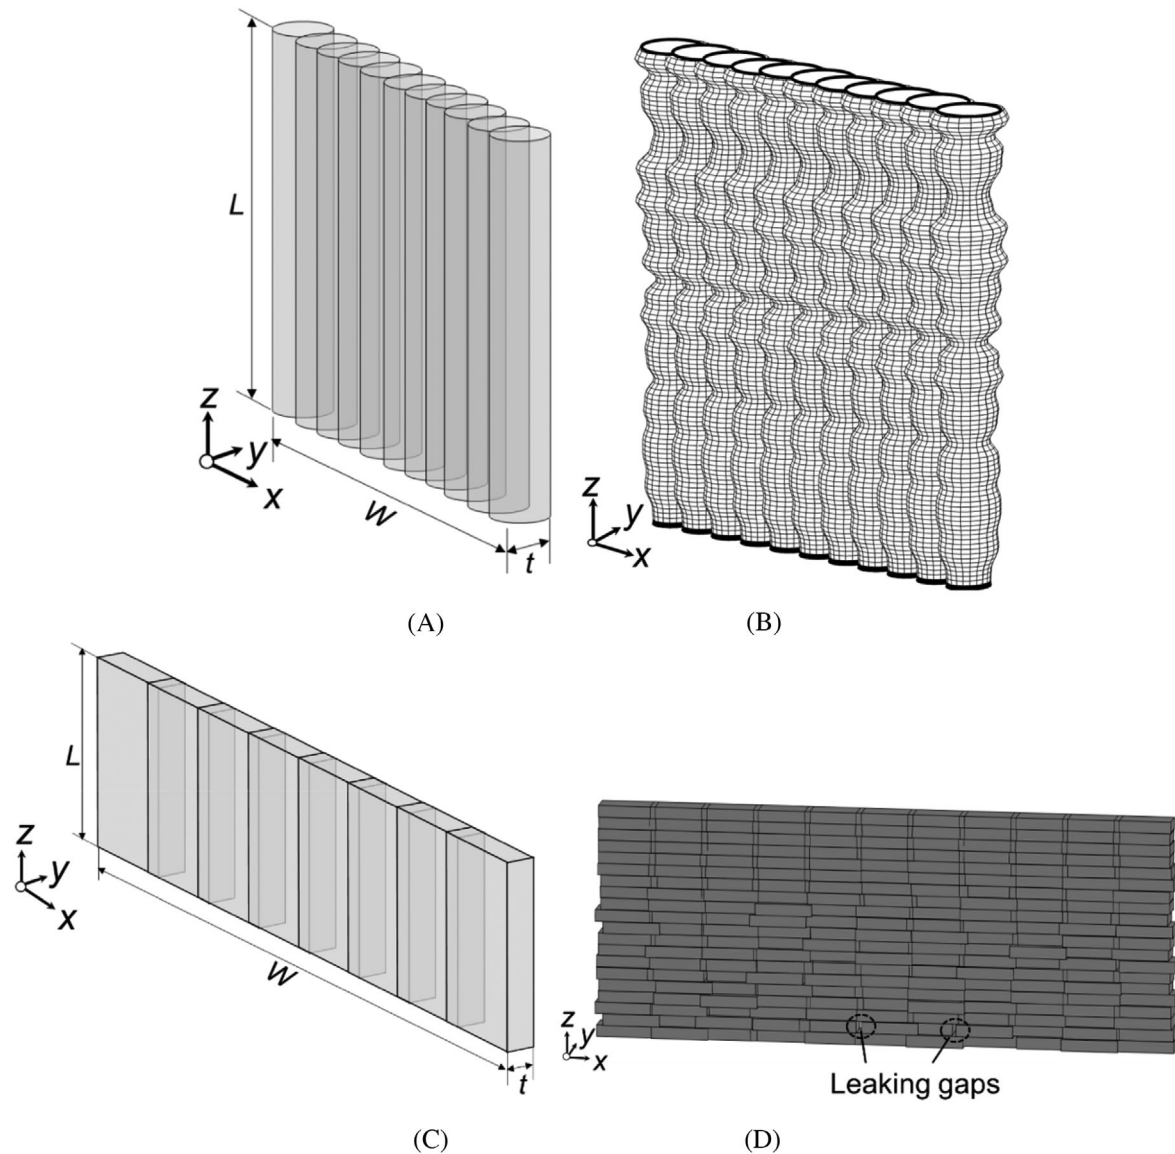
Two types of cutoff wall: (A) jet-grouted cutoff wall (ideal); (B) jet-grouted cutoff wall (defective); (C) diaphragm wall (ideal); and (D) diaphragm wall (defective)
